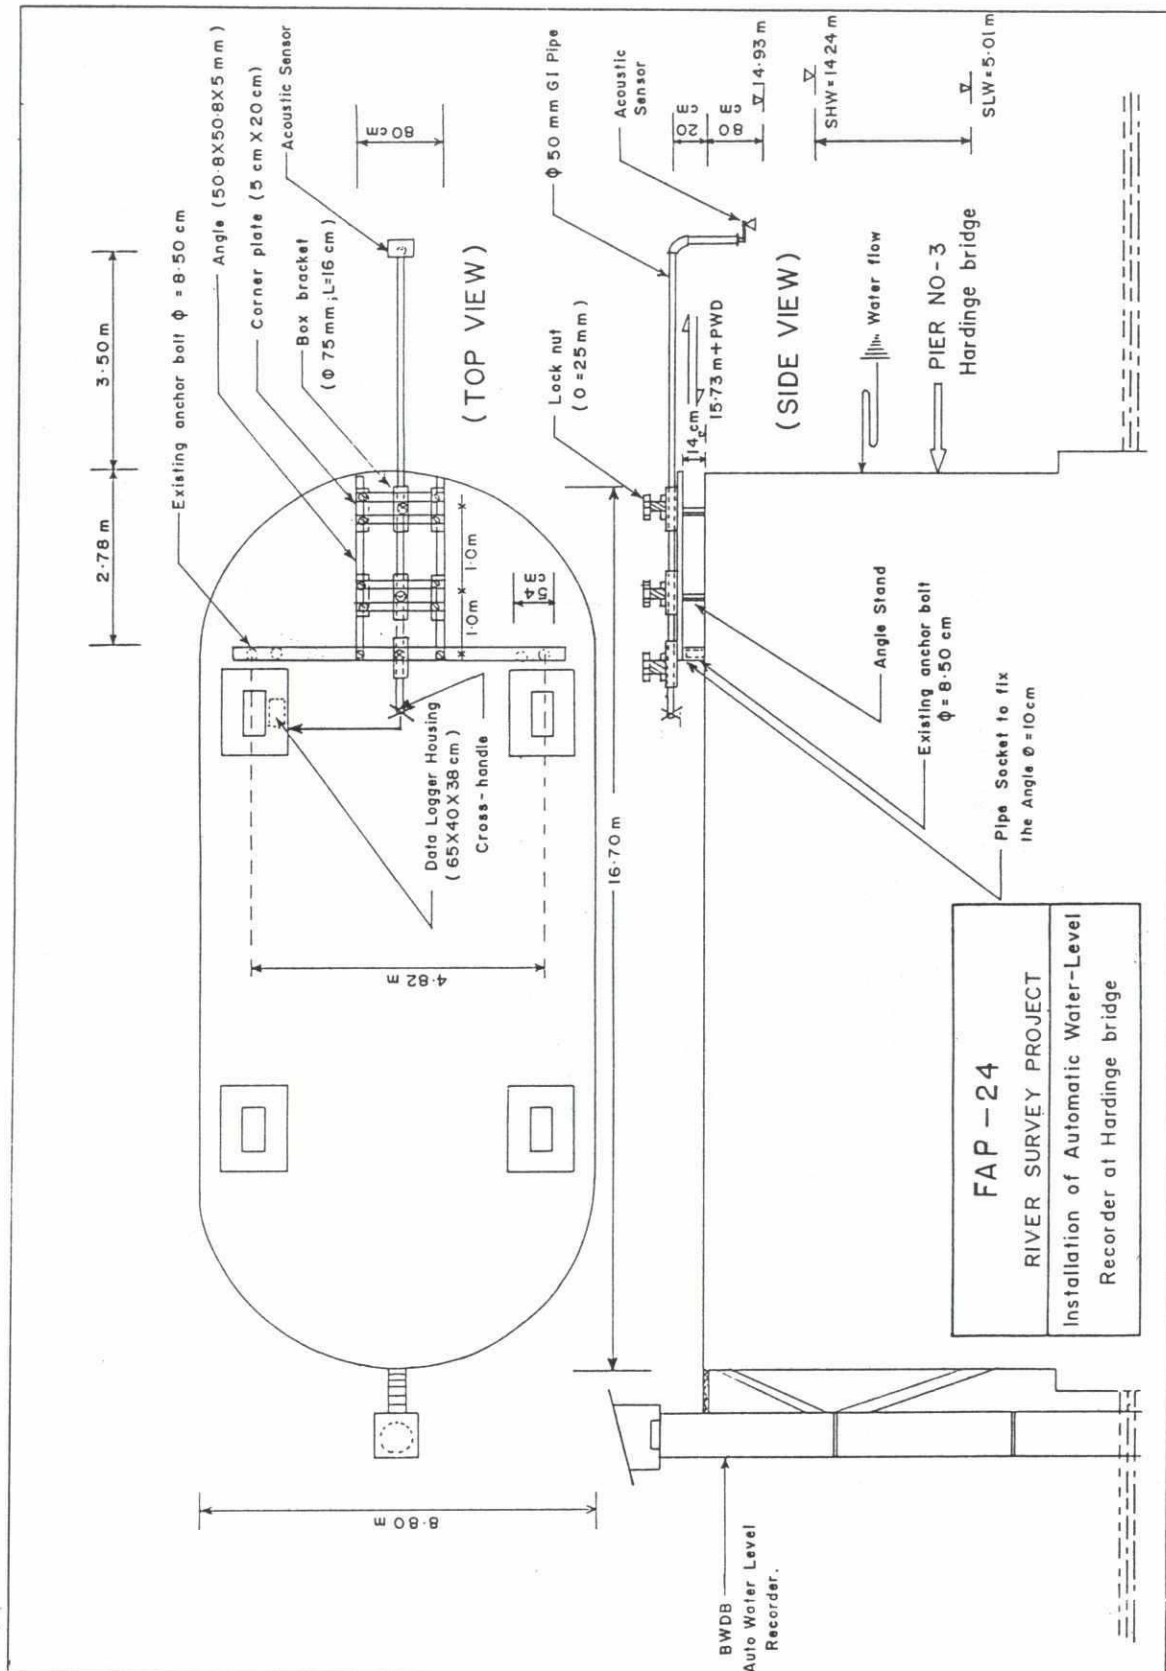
The design elements of the AWLR fixing at the Railway Bridge pier at Hardinge Bridge
